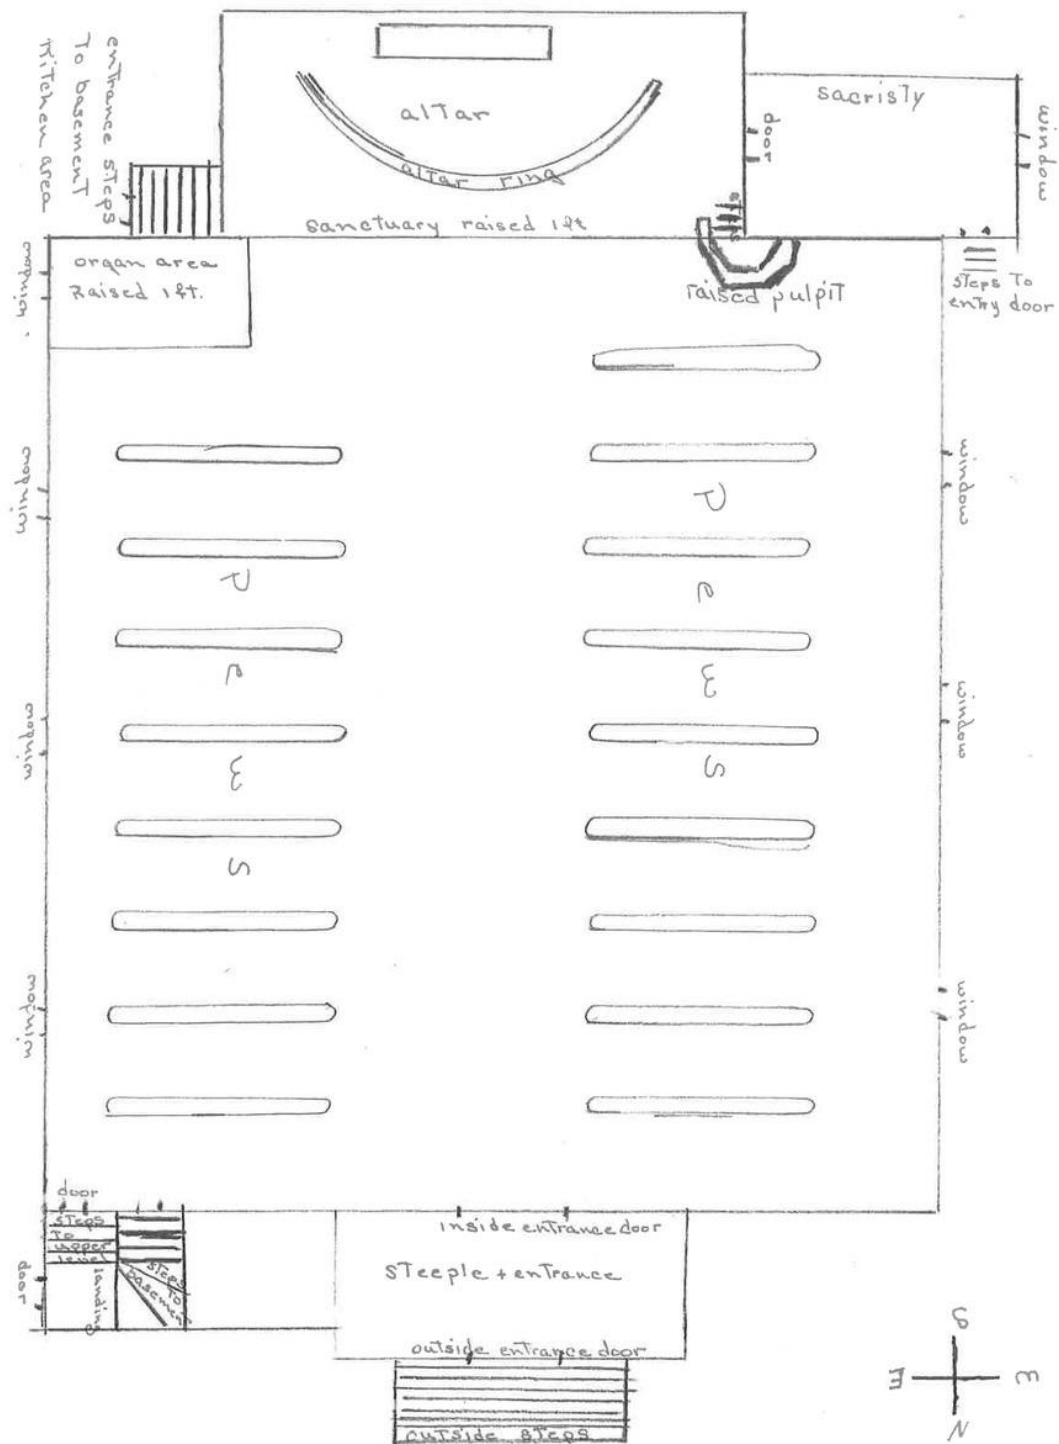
Interior main floor plan (not drawn to scale). (Source: Greg Gilbertson, Waukon, Iowa, February, 2018)
